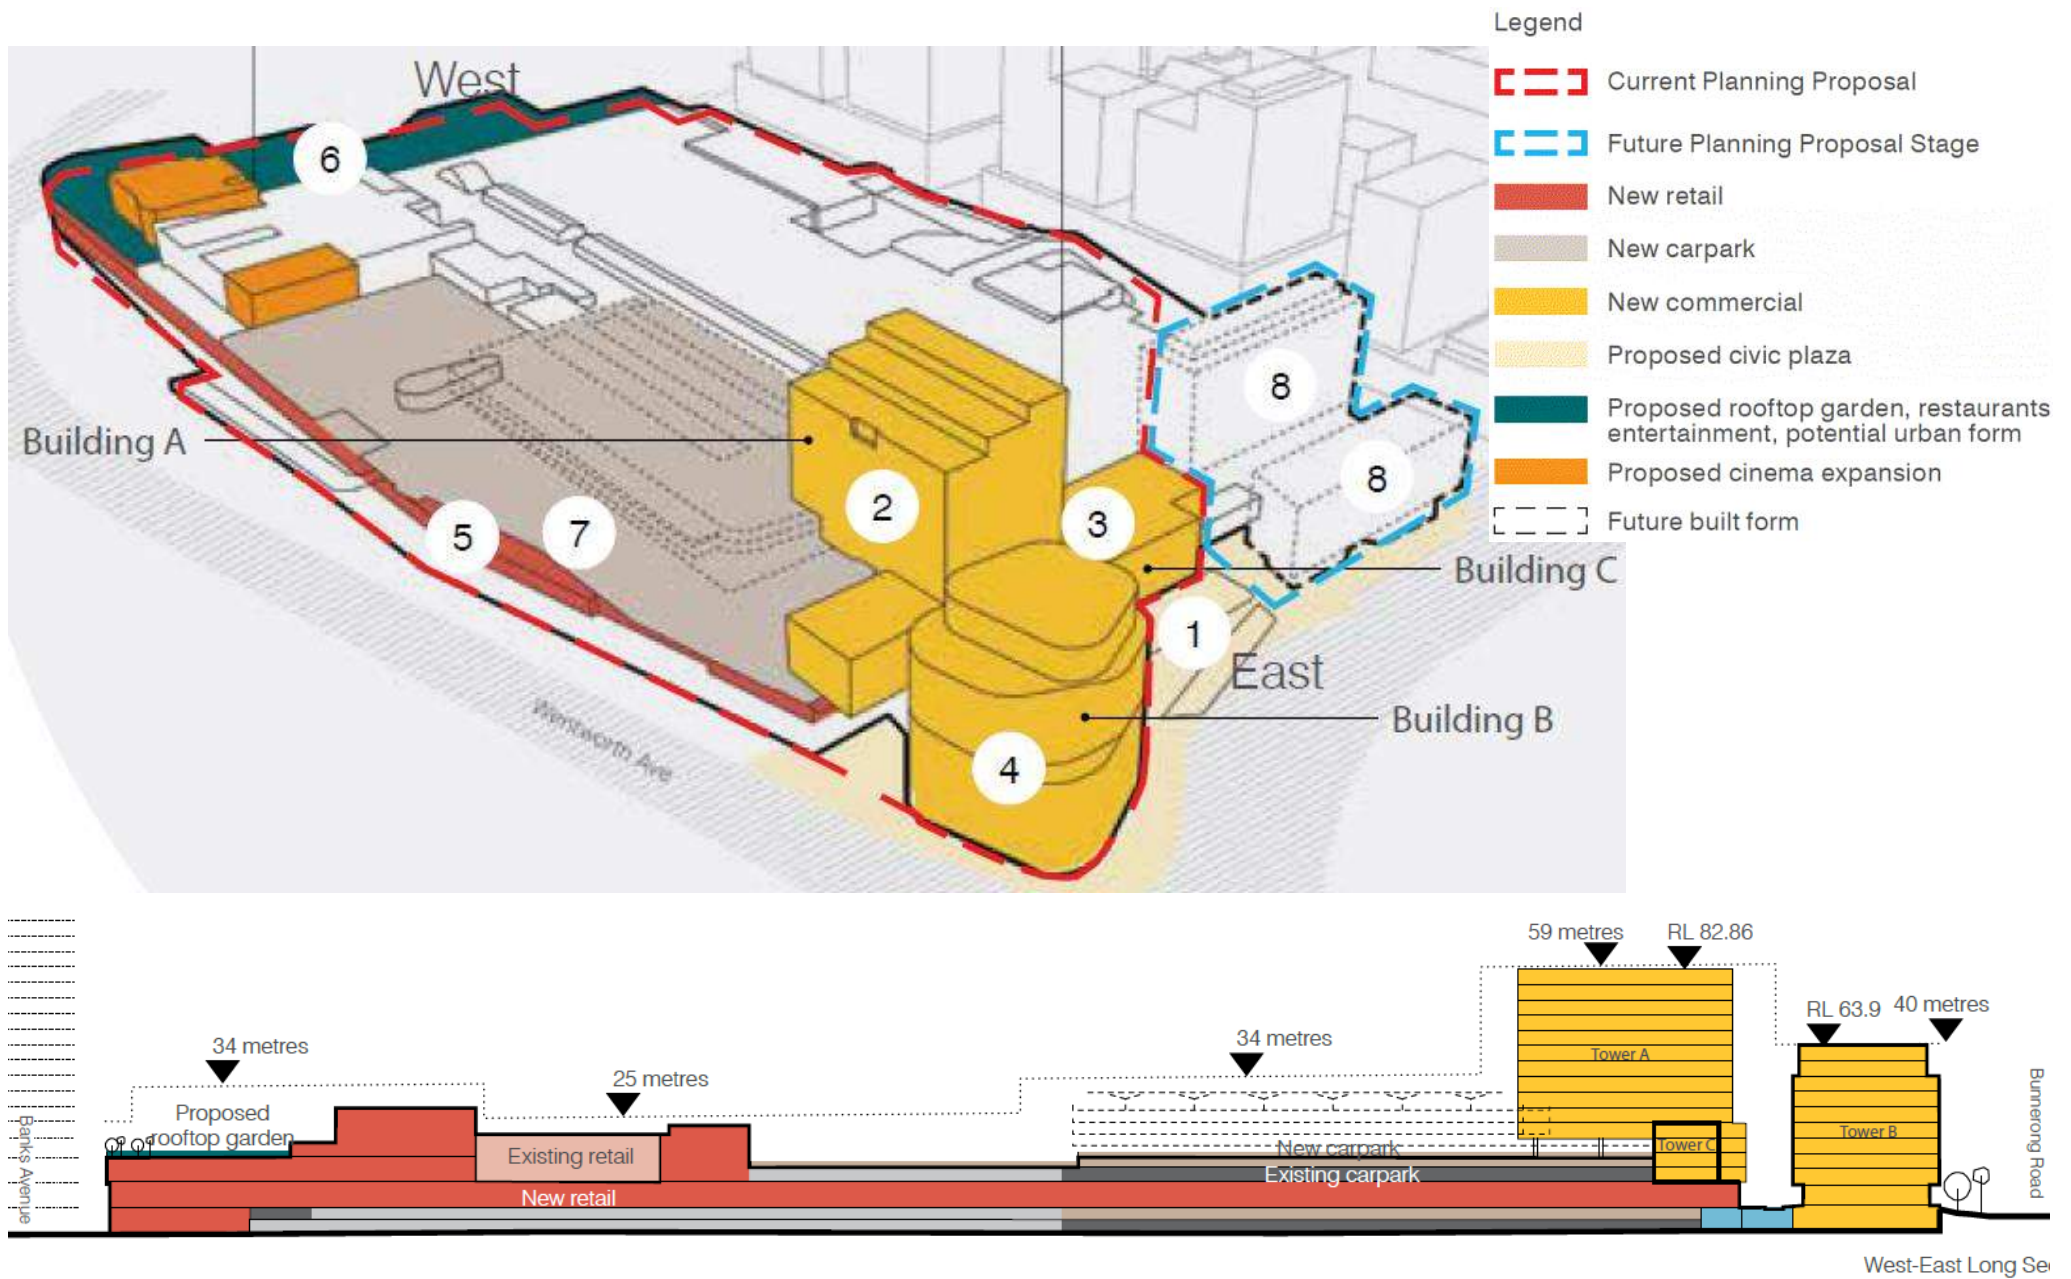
Proposed Development Layout Including Perspective View (Upper Image) and Elevation Section for Southern Side of Building (Lower Image) (Source: Scentre Group)
